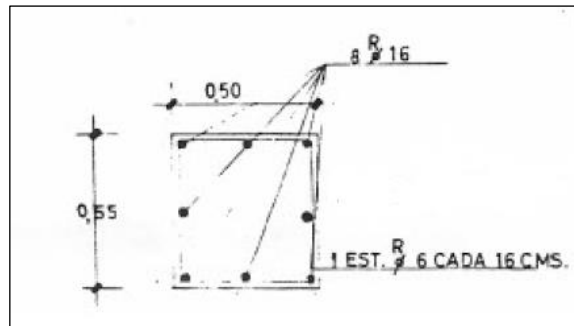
Second floor Column section. Source: (SIGMA & Servicios de Ingeniería, 2016)
